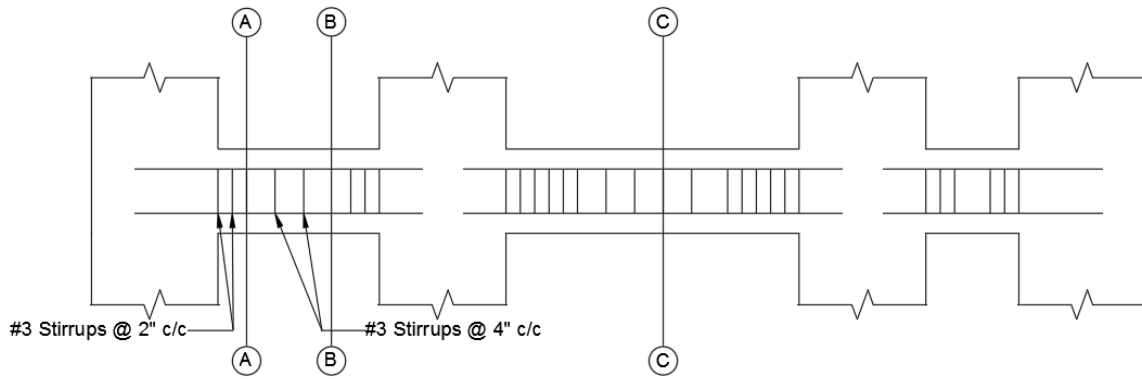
Beam rod detailing for Y-axis 4F
